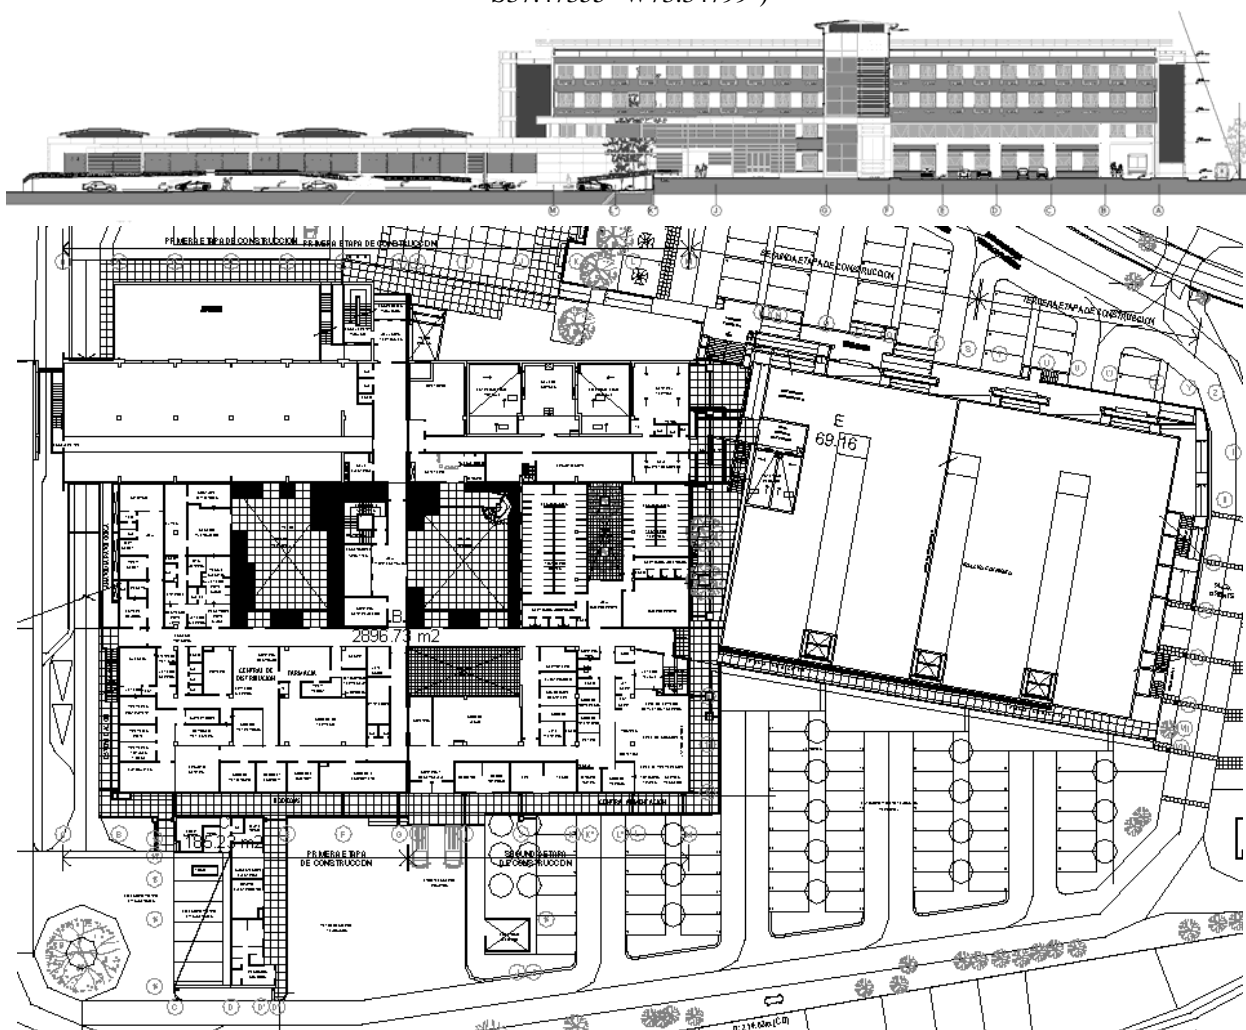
Front elevation looking to the south and plan drawings of the hospital (courtesy of Mr. Aldo A. Faúndez Contreras)
